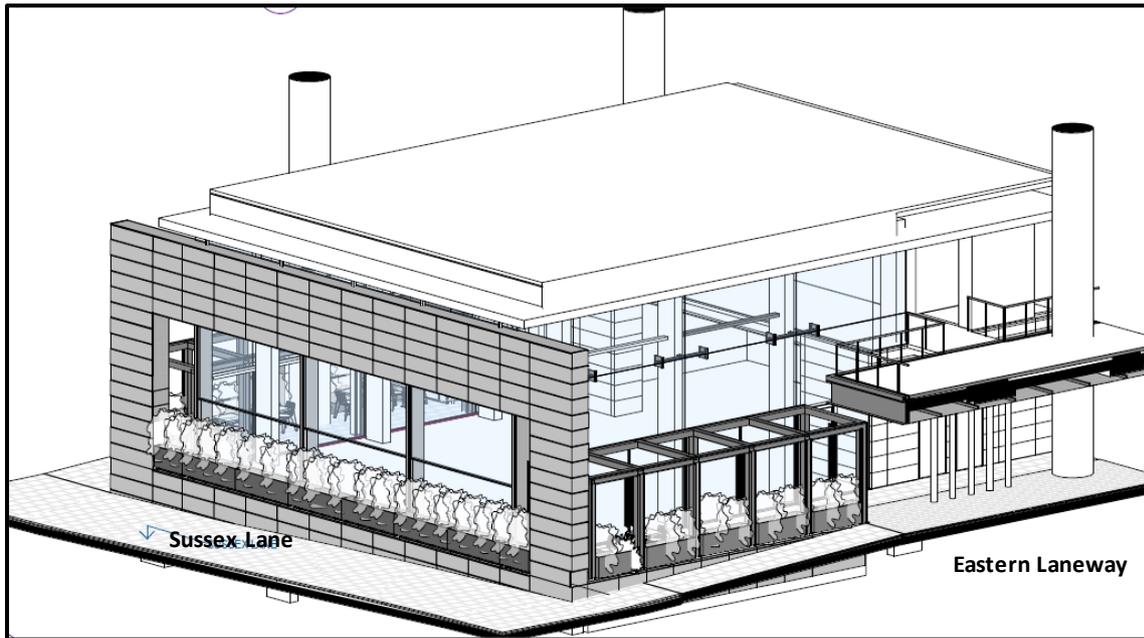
Perspective of eastern and southern facades of proposed Retail R15 viewed from Sussex Lane.
